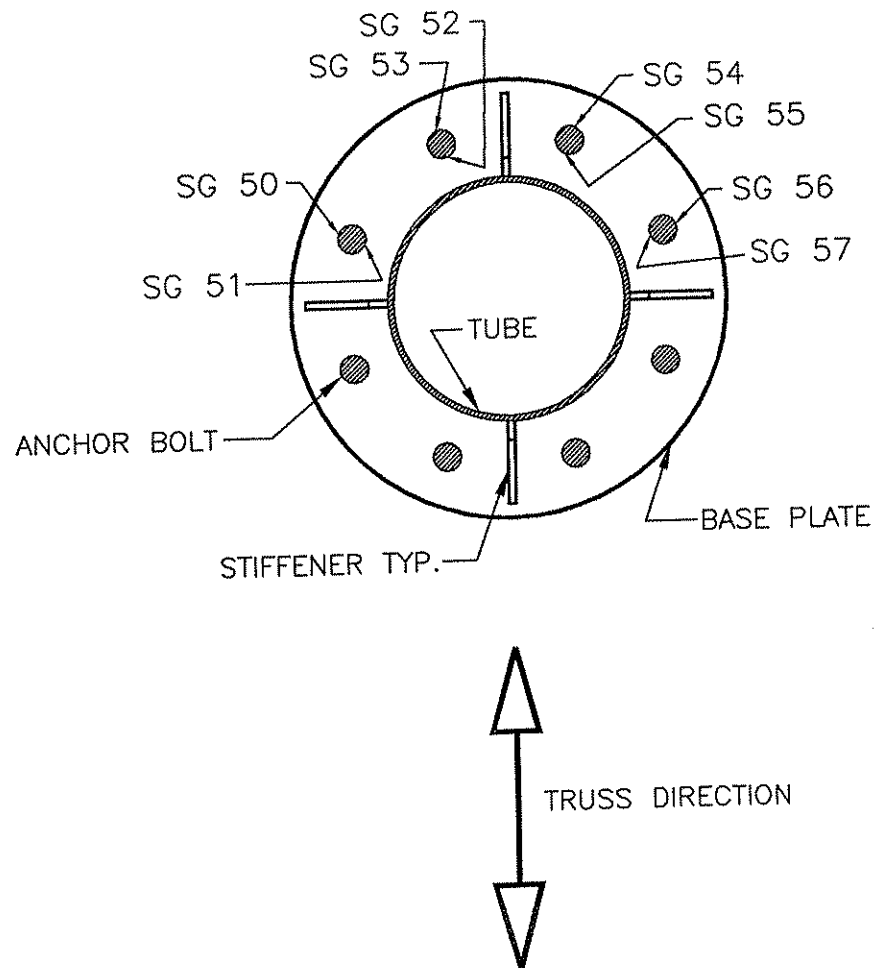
Strain Gage Locations on Anchor Bolts.
